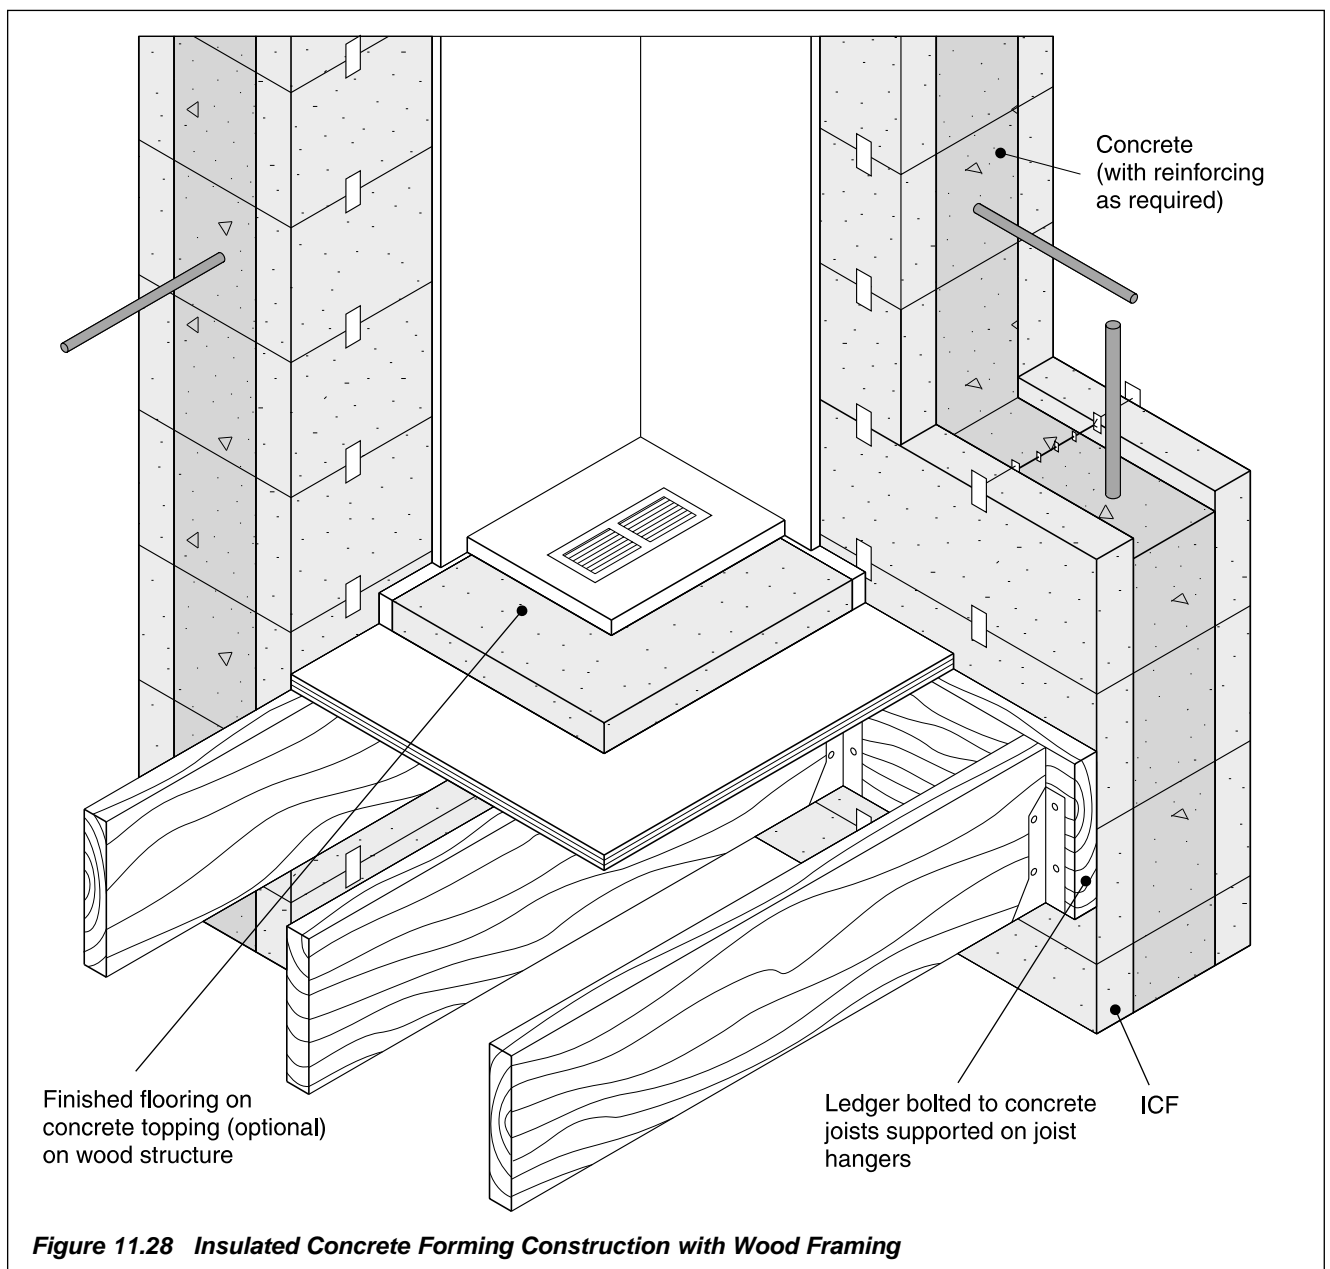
Insulated Concrete Forming Construction with Wood Framing
